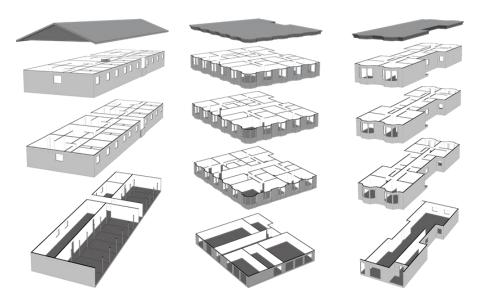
Typical configurations of soft, weak, or open-front buildings (image credit: FEMA P-807).
